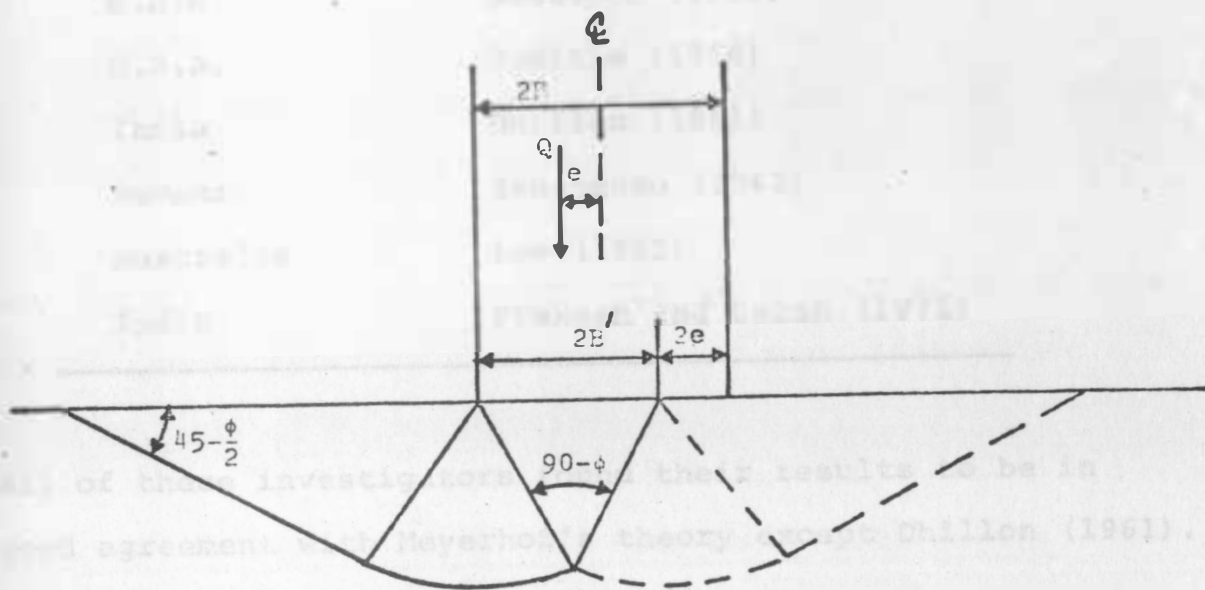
Eccentrically loaded footing(after Meyerhof (1953)).
